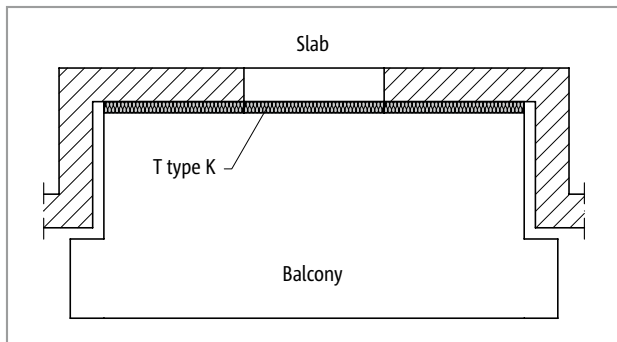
Schöck Isokorb® T type K: Balcony with facade recess
